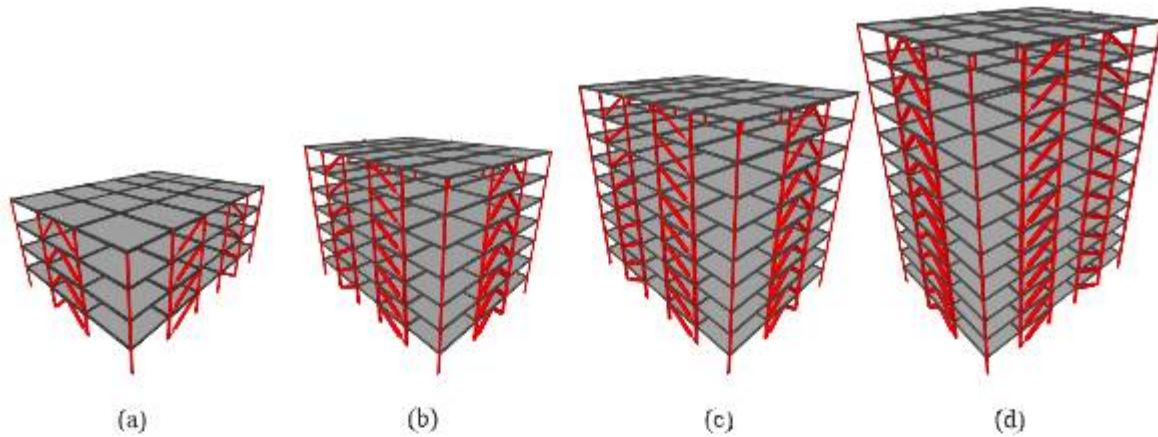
Three-dimensional overview of the case study buildings (RL-BRBF configuration shown only), (a) 4-story building, (b) 7-story building, (c) 9-story building, (d) 12-story building.
